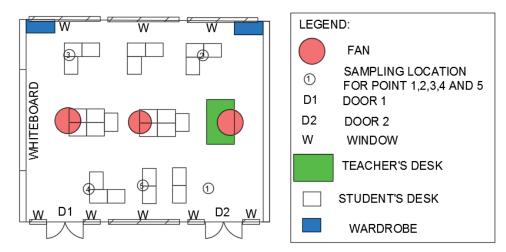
Floor plan at Level 3 of SK Machang Bubok
